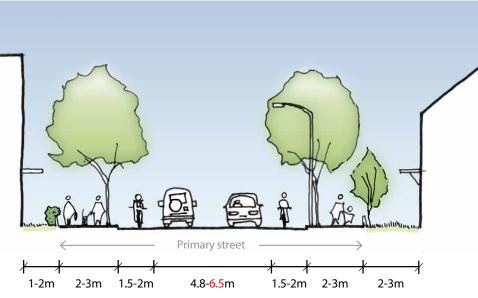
B-B – typical primary street cross section (refer to Figure 19 for section location)
